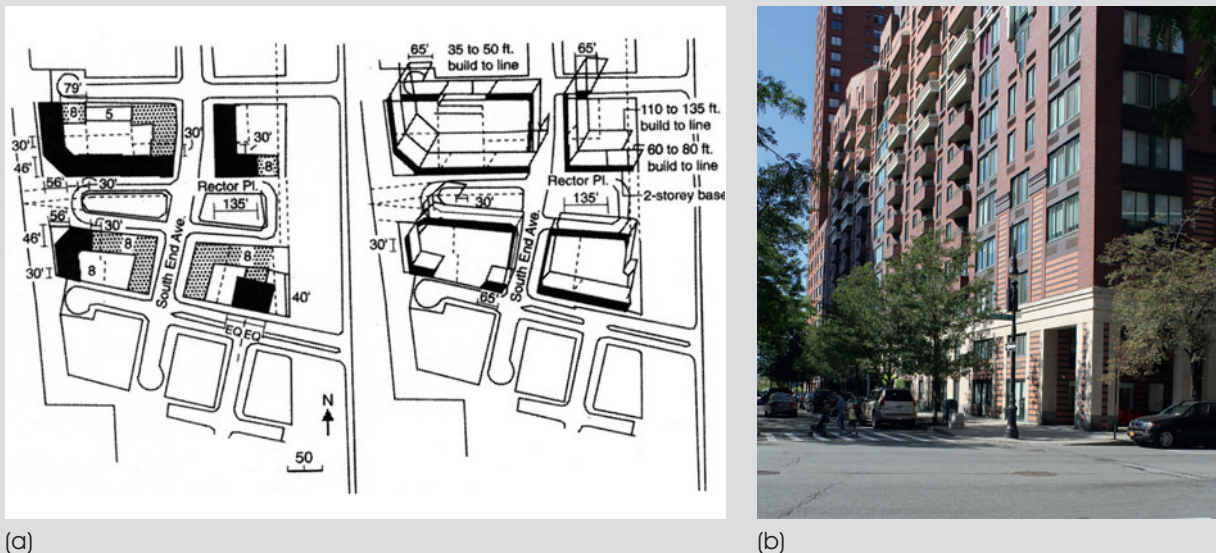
Rector Place, Battery Park City, New York. (a) Design guidelines: plan and heights (left) and street wall (right); (b) the appearance today.
